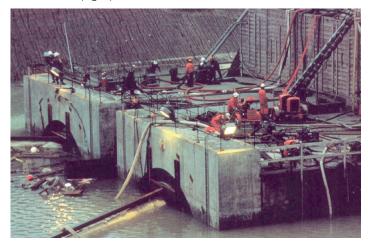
Storebælt tunnel. Flooding of the Sprogö construction site [1]
